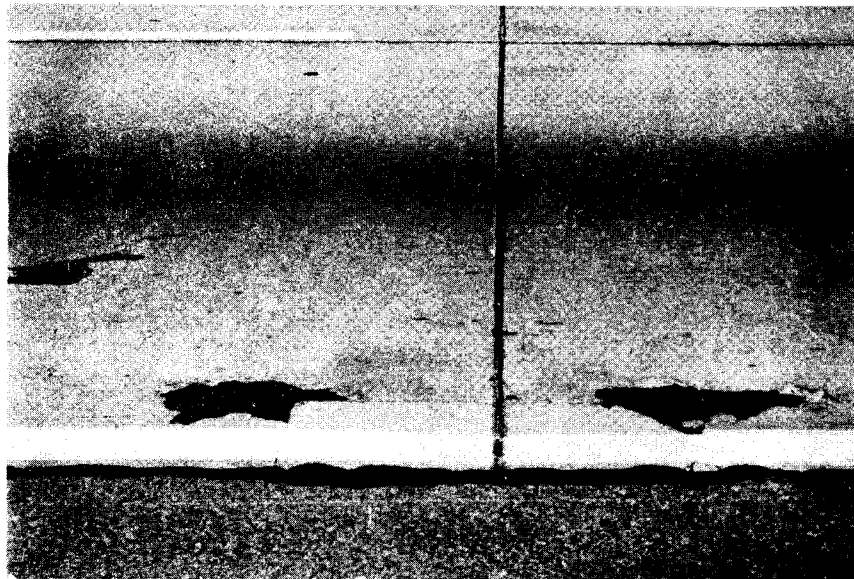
Spalling of adjacent pavement due to high compressive stresses transmitted through patches.
